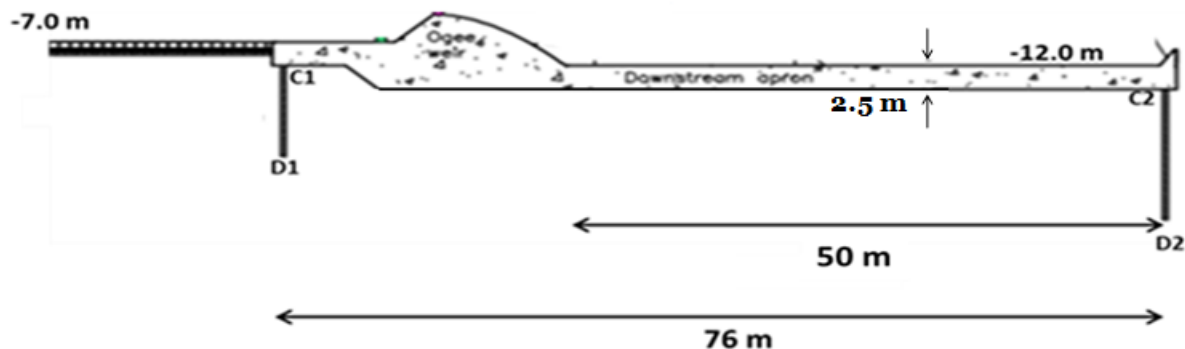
Schematic diagram showing thickness of stilling basin raft
